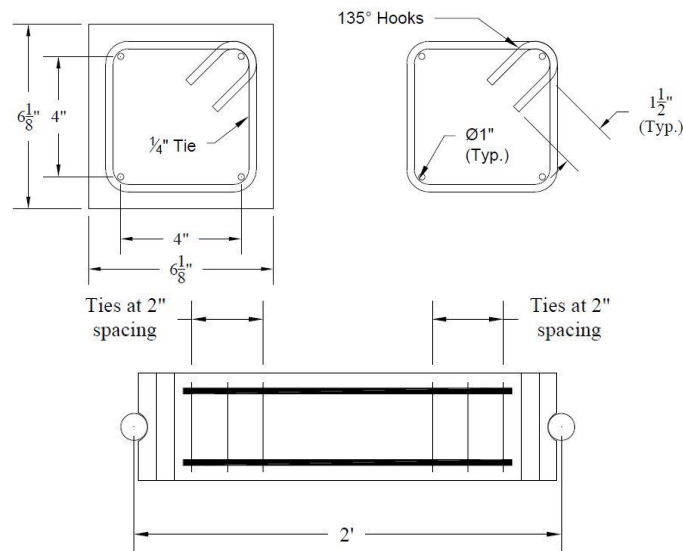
Reinforcement details for a short RC column tested by Jenkins (2015).
